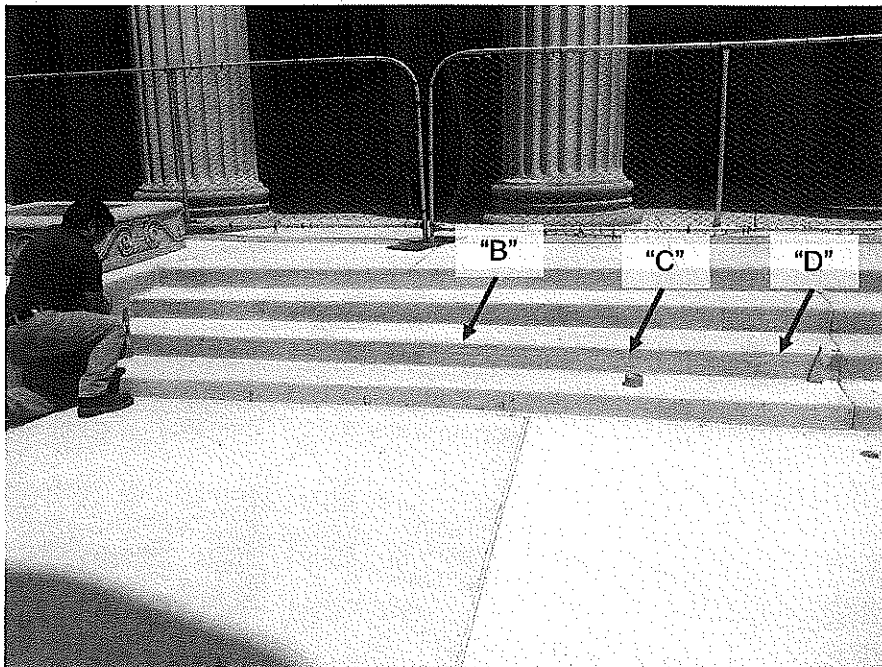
OVERALL PHOTO AT STAIRWAY A, NORTH SECTION
